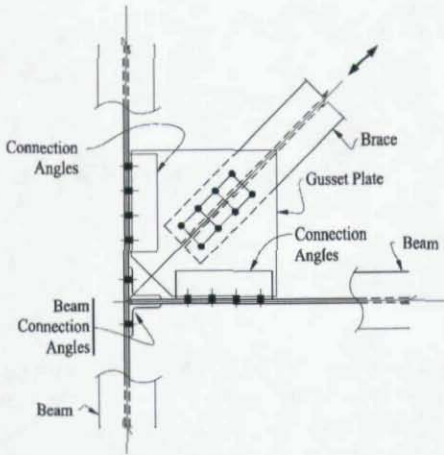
Horizontal brace connection at beam-to-beam intersection.
